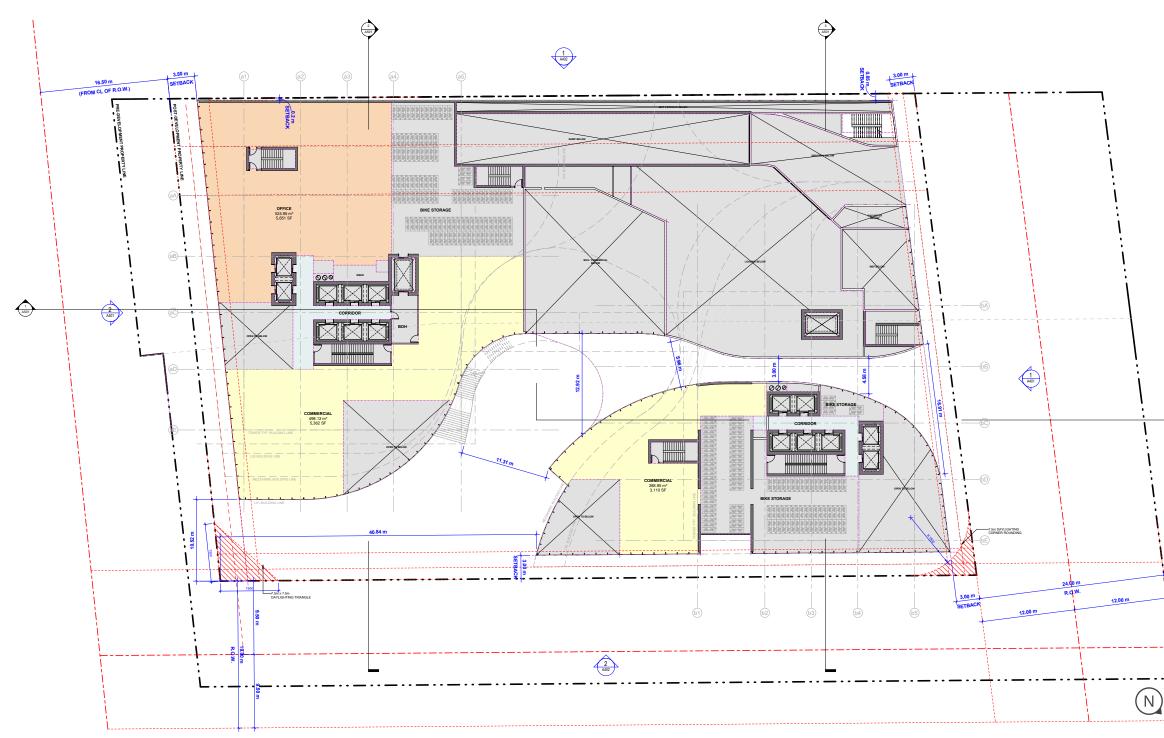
Level 2 Plan (Provided by Teeple Architects)
